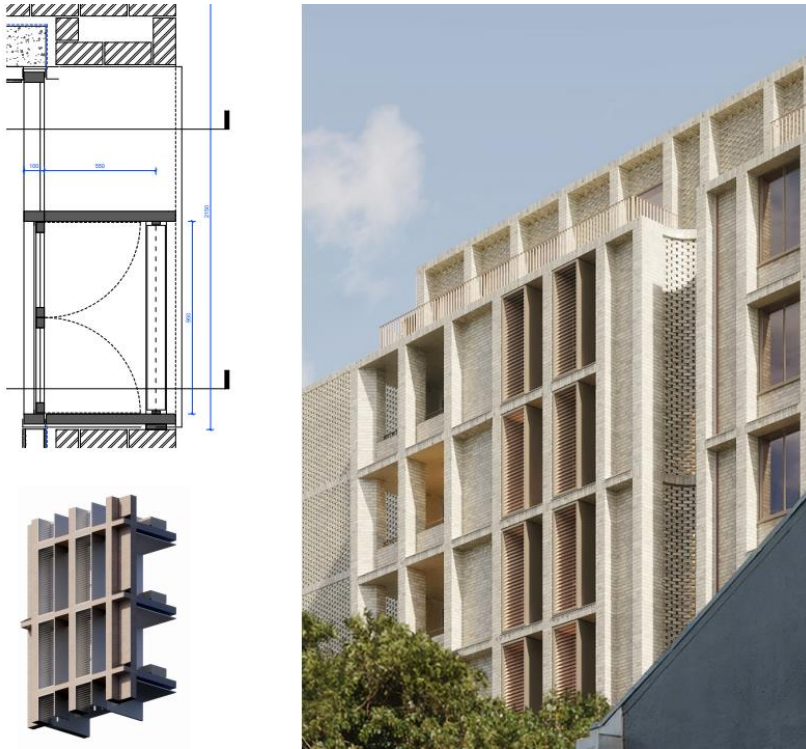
Acoustic treatment to windows (Source: EM BE CE Design Report)
